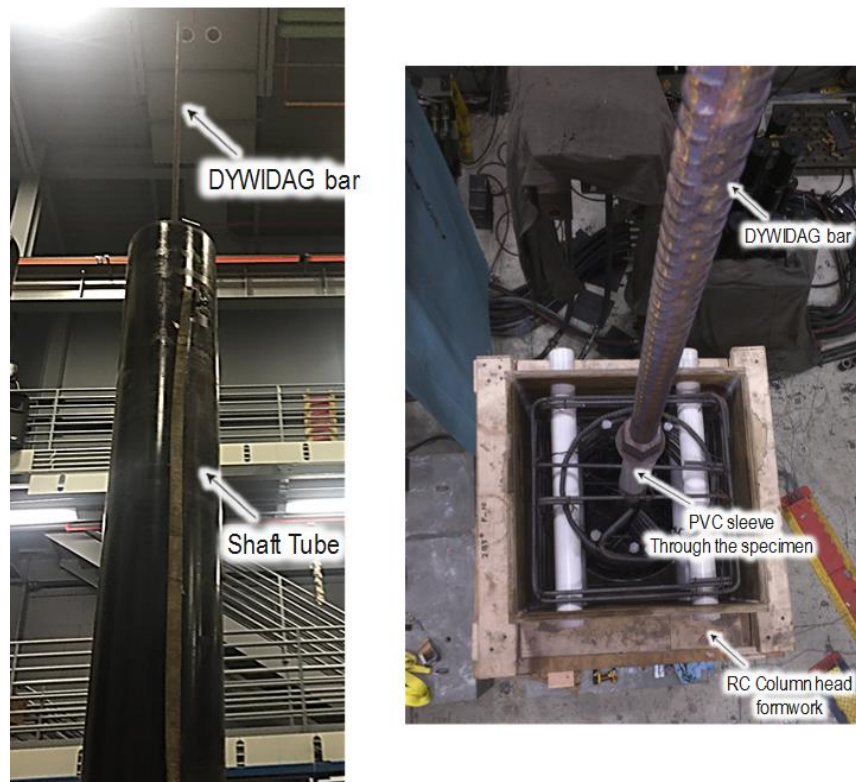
Reinforced concrete column part concrete pour and vibration.
